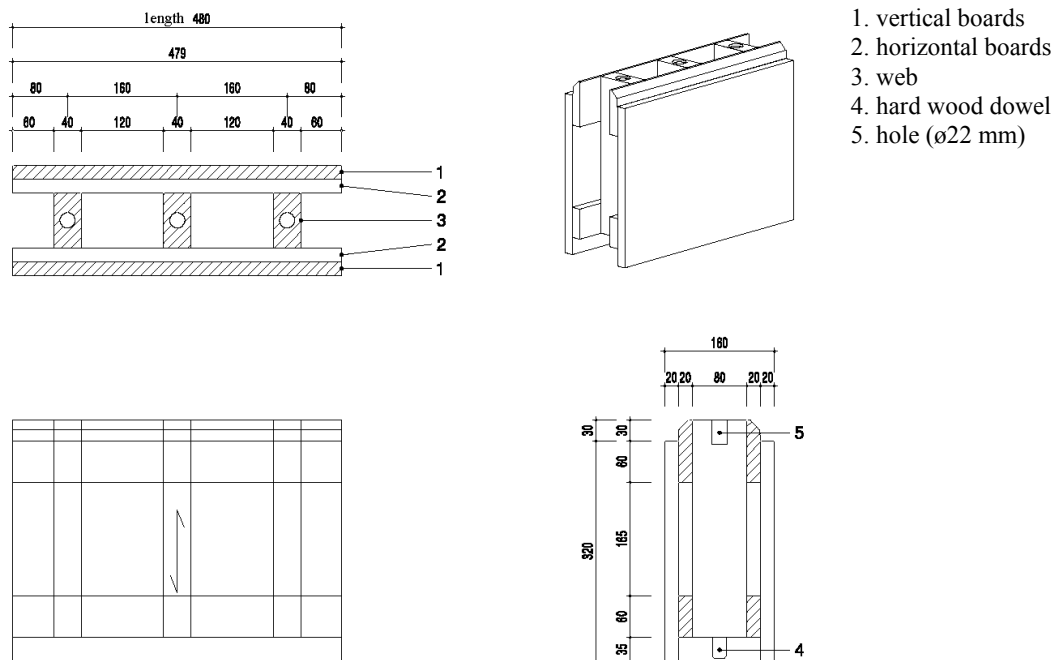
Geometry of STEKO basic hollow timber blocks made from cross-glued boards.
